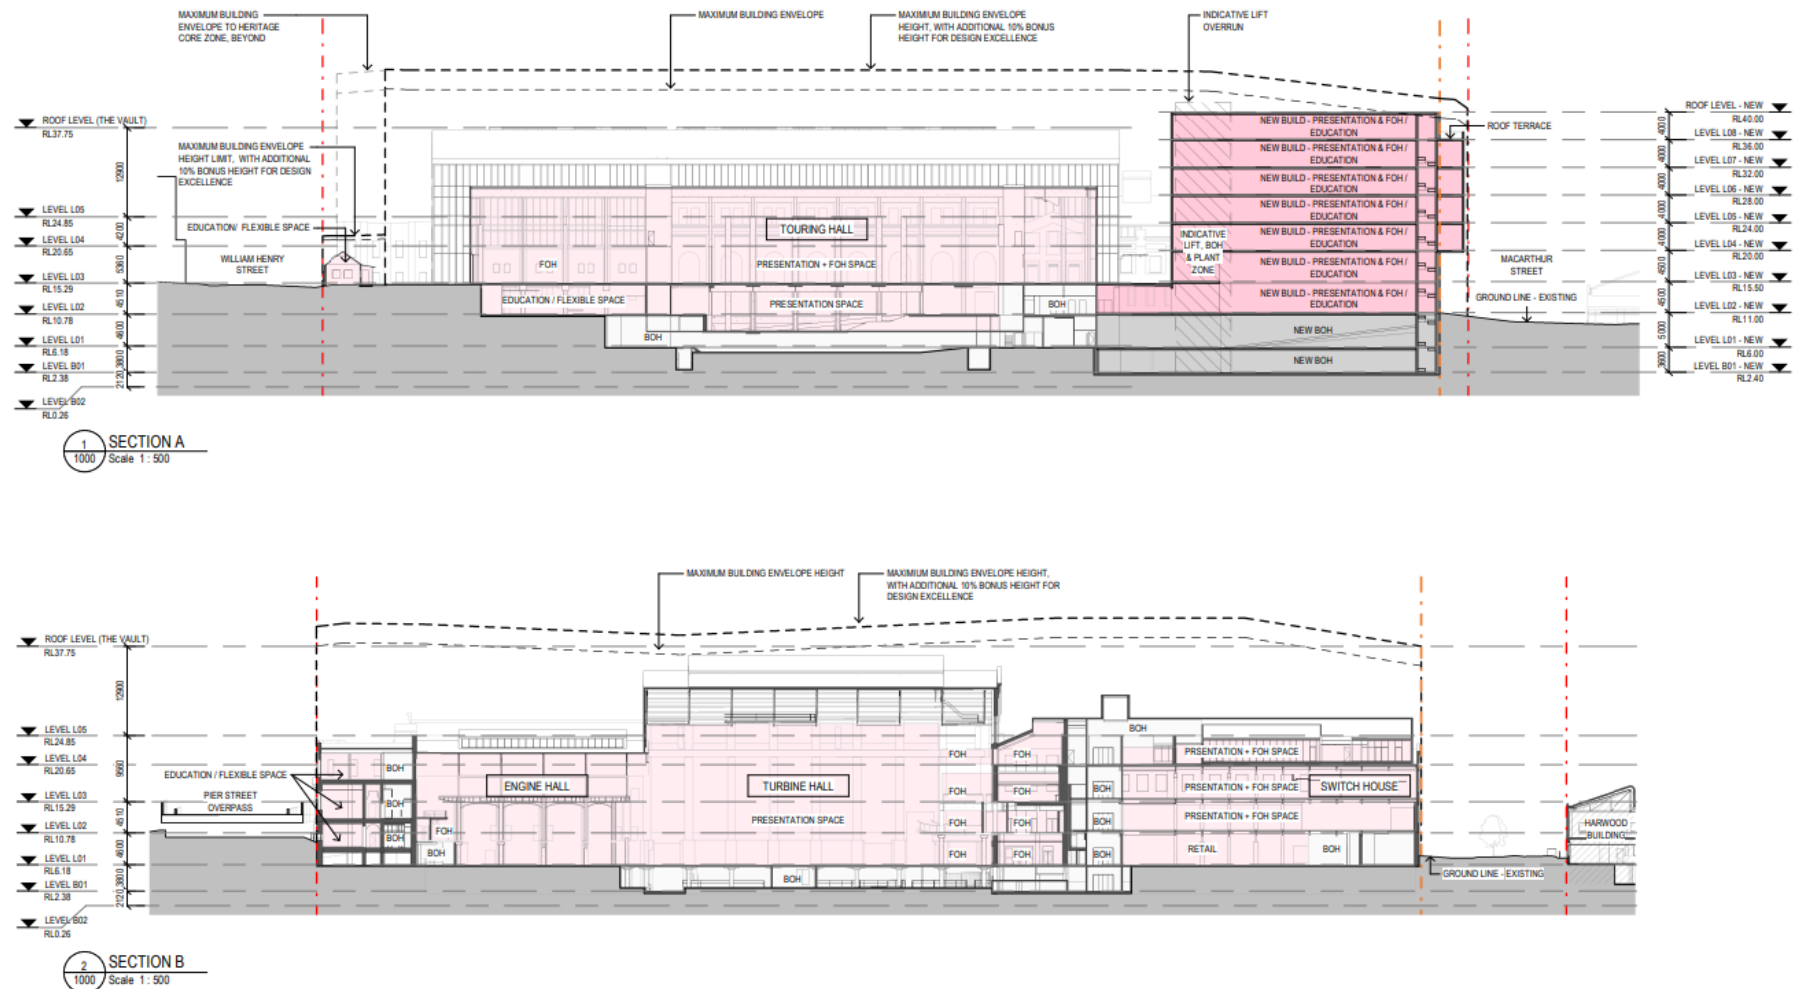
Ultimo Powerhouse- Powerhouse Sections 1 and 2 (Source: John Wardle Architects, 17 May 2022)
